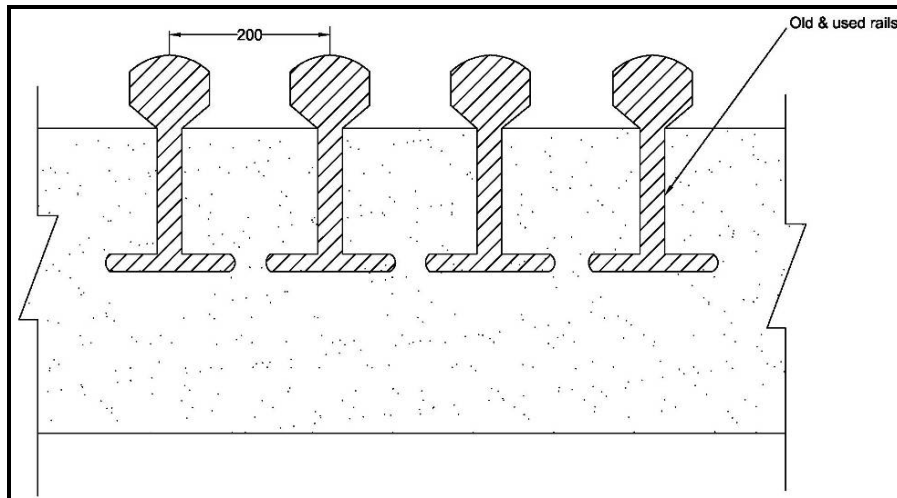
Typical Arrangement of Protection of Trench Weir with Steel Rails
